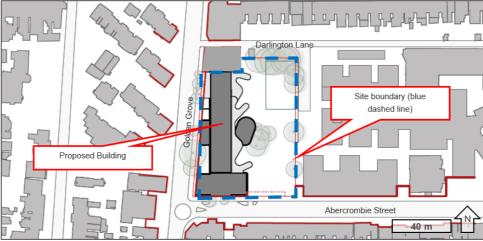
| Proposed layout (Base source: Applicant's EIS 2020)
